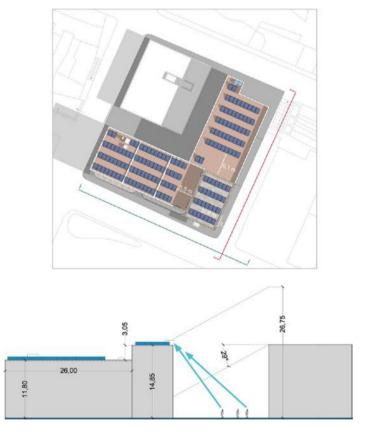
City hall floor plan and visibility study for solar modules (via Concezione)
